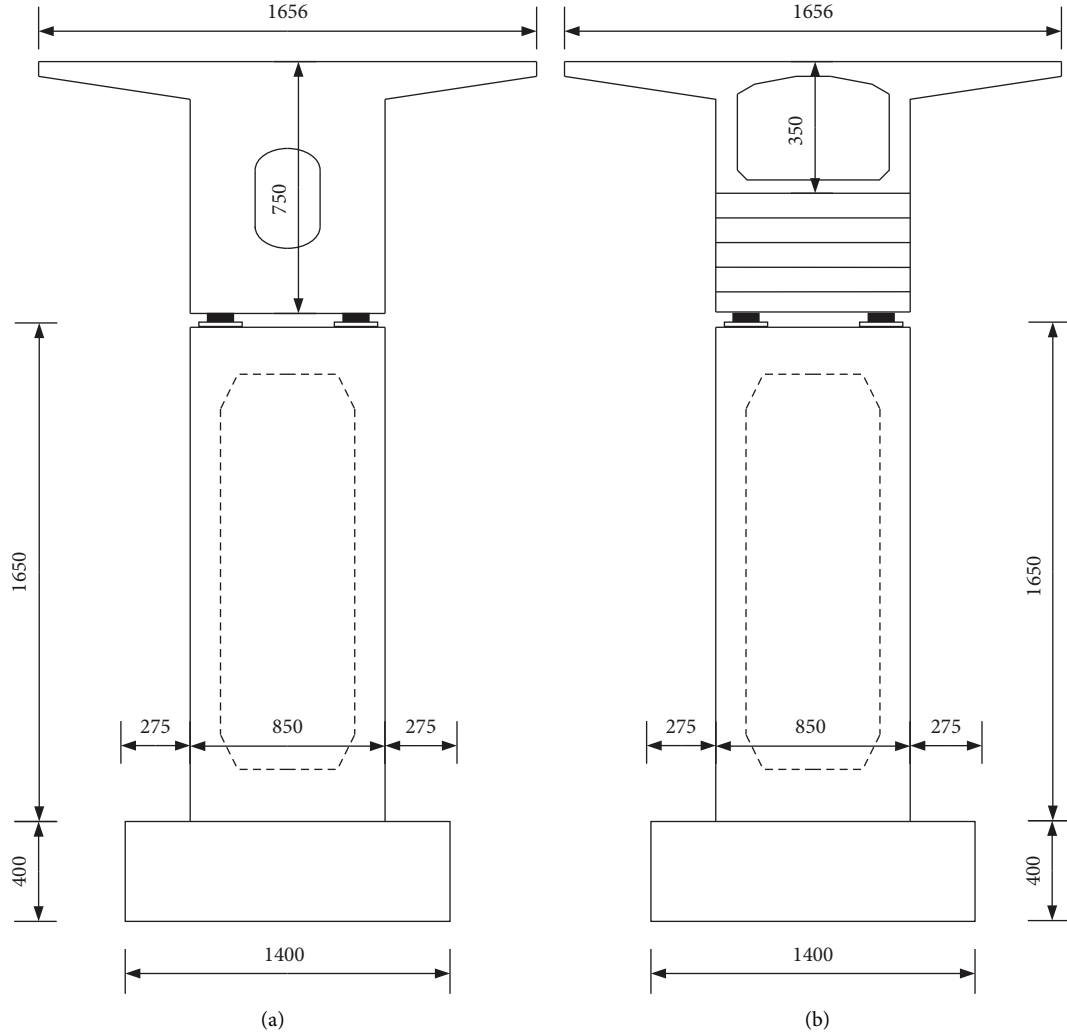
Transverse views of the bridge (unit: cm): (a) cross-section of the top of the pier and (b) cross-section at the midpoint of the span.
